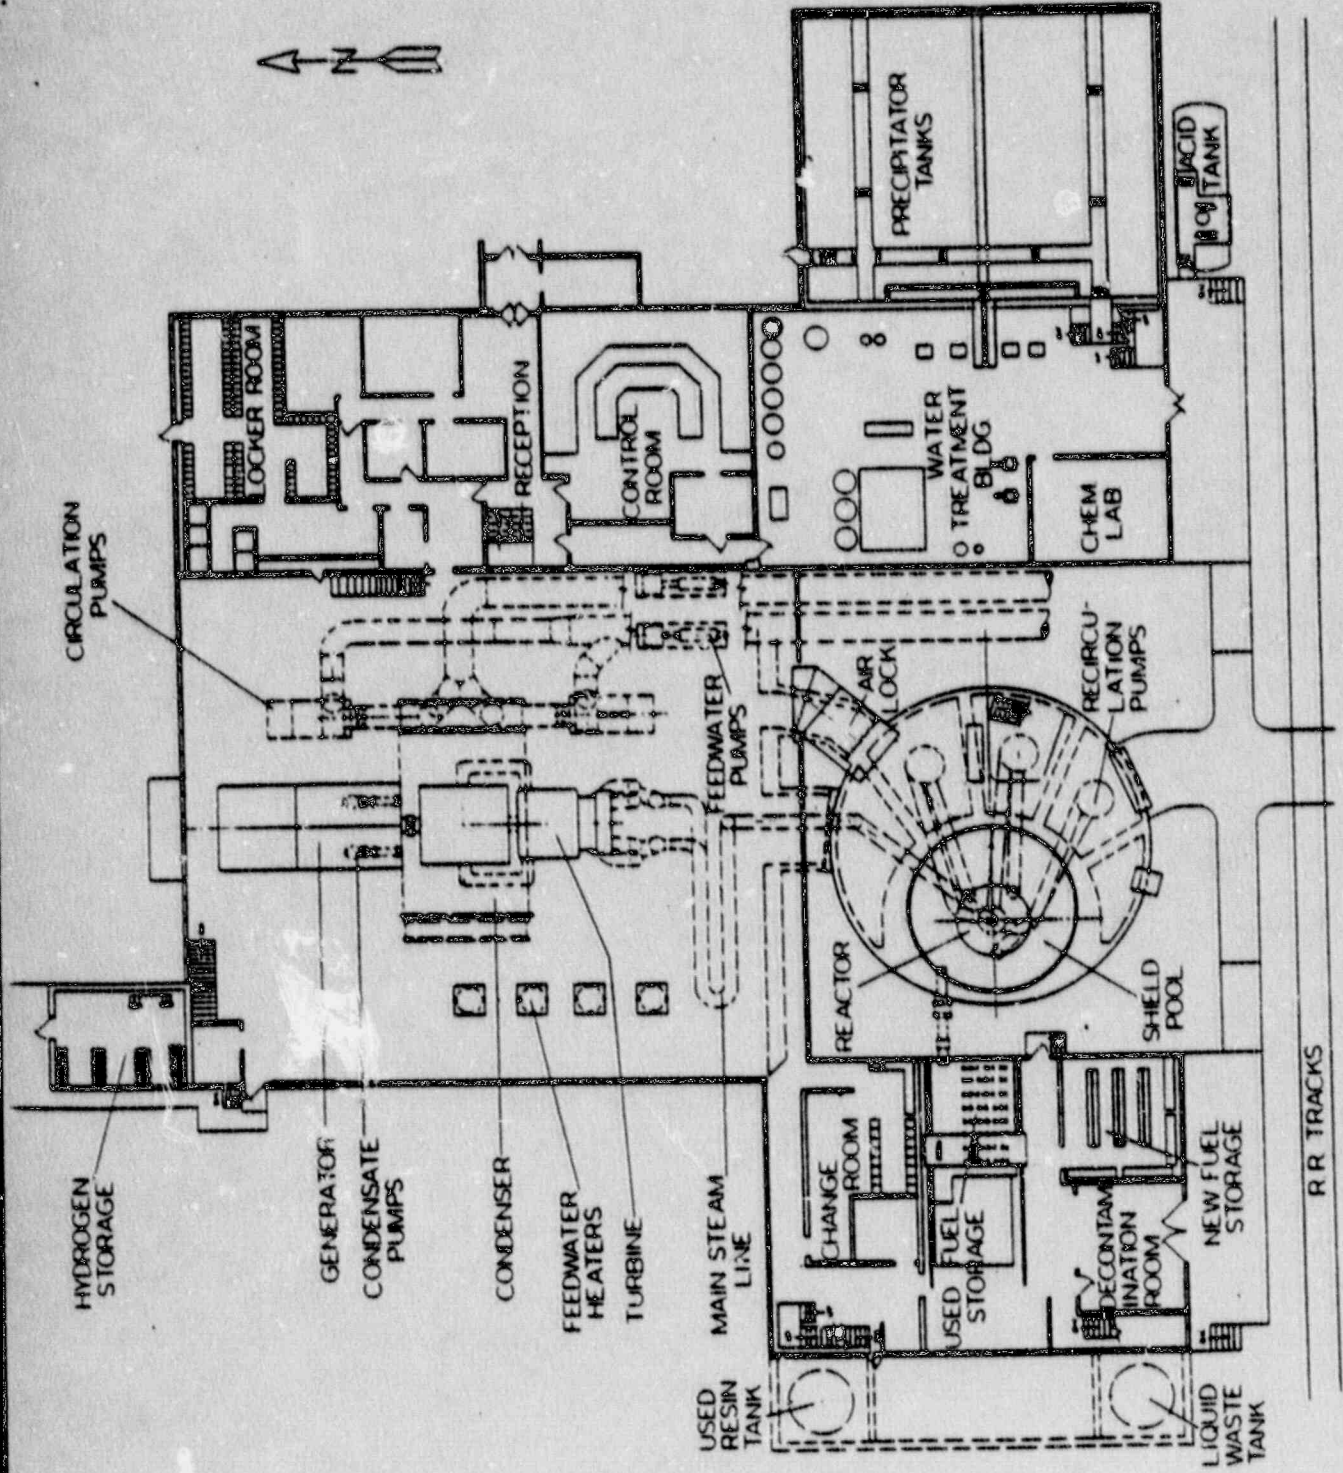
Figure II is a floor plan of the reactor facility and associated systems. Figure III is the same floor plan with the addition of the added or modified facilities.
